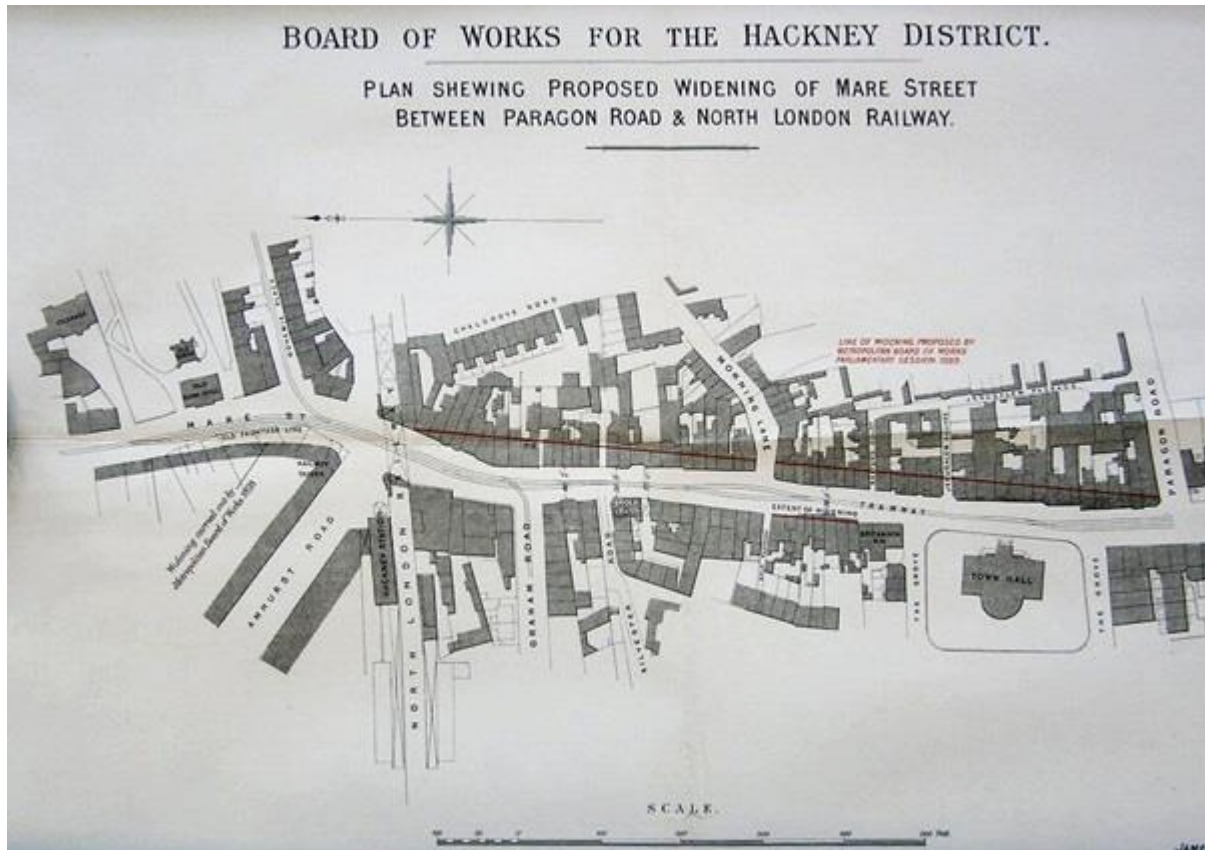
The original plan to widen Mare Street, 1900 (LCC ref: LCC/CL/IMP/1/127)
